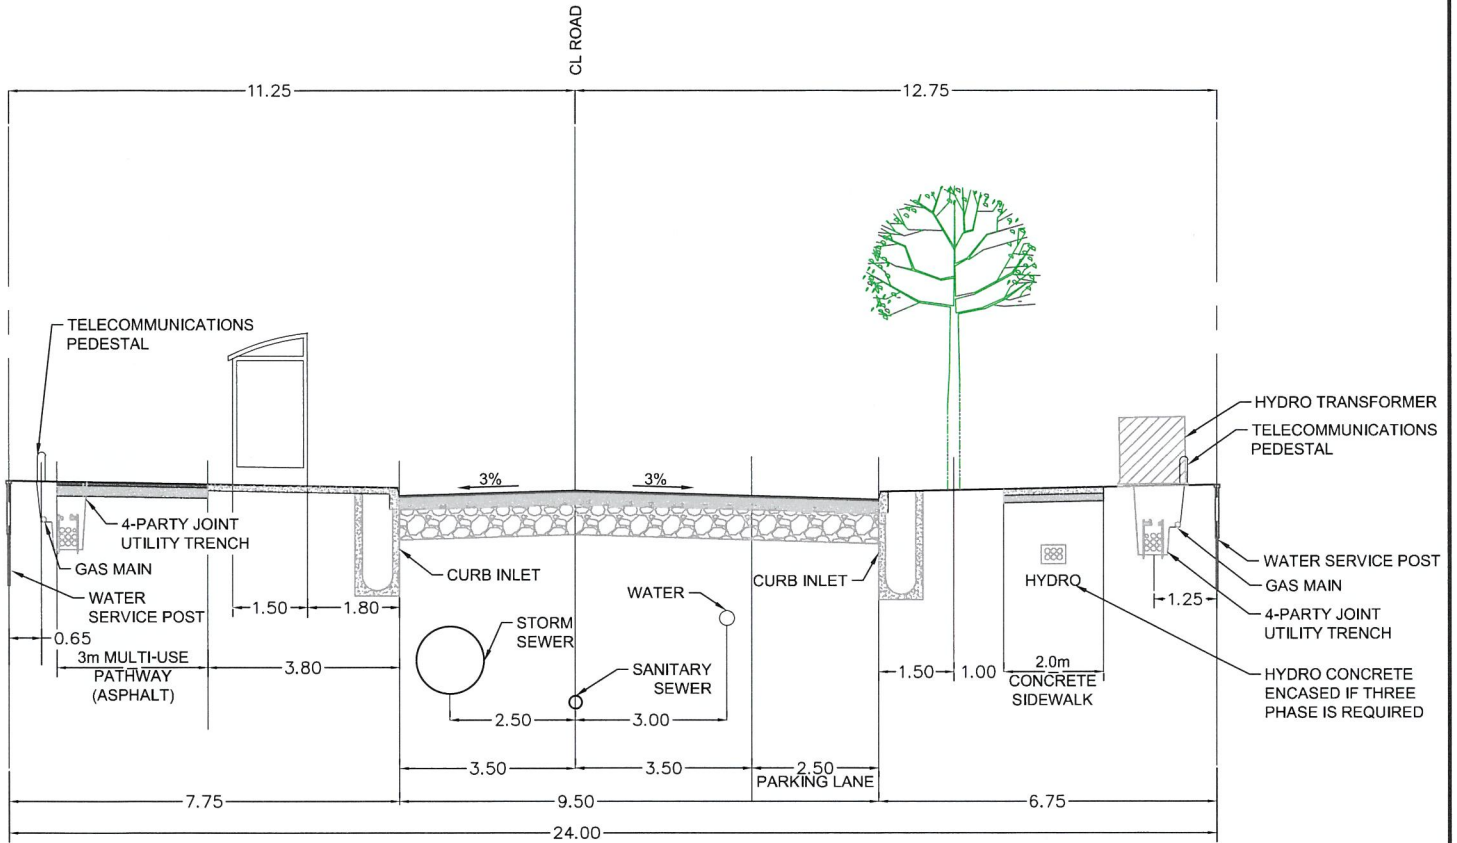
COLLECTOR ROAD - TYPICAL CROSS SECTION 1
